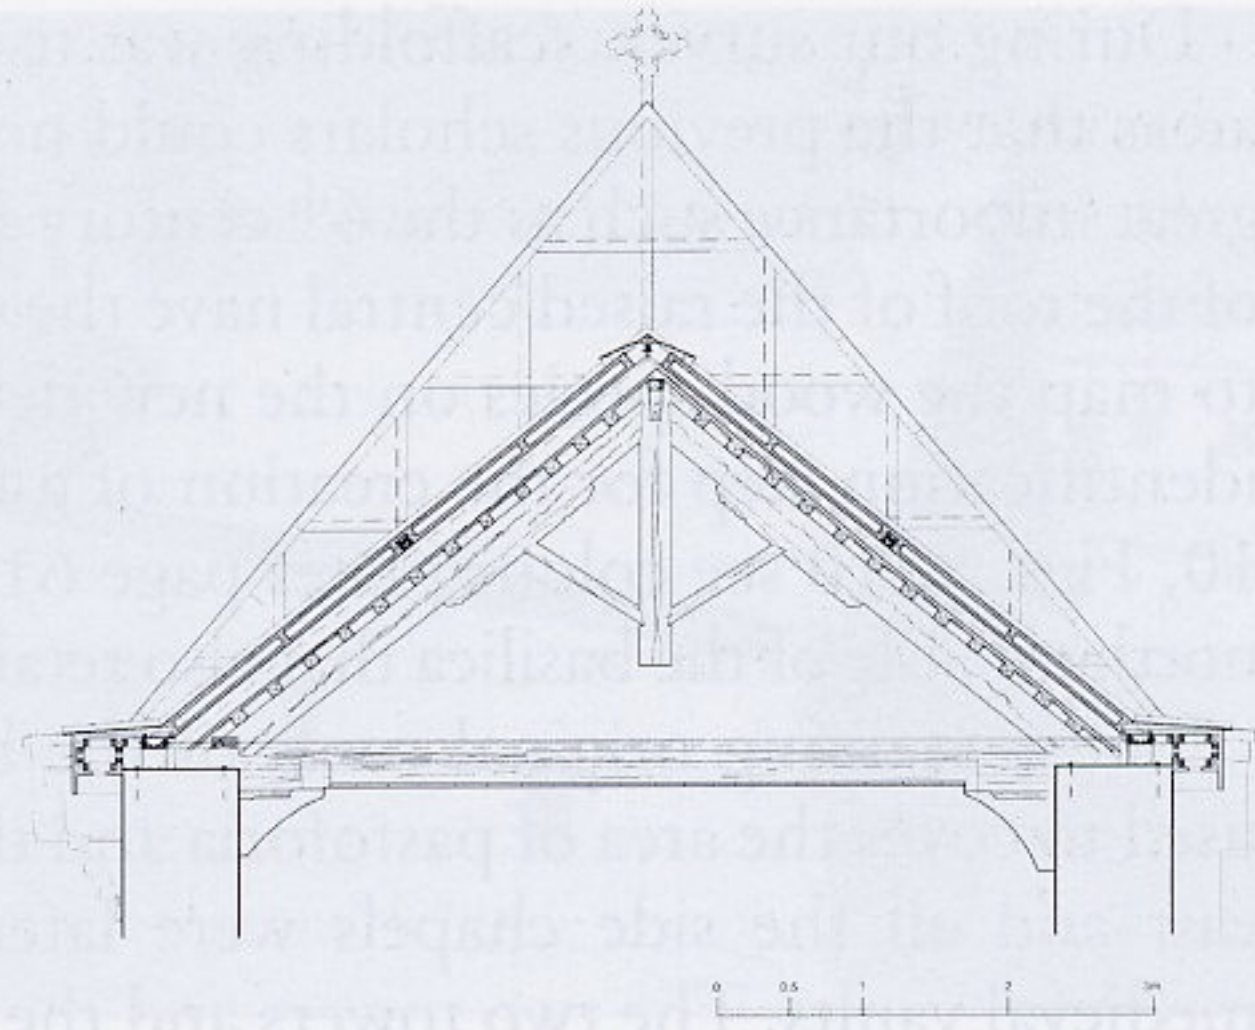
Elevation of rafters of the main trusses and the wooden decking behind them.
